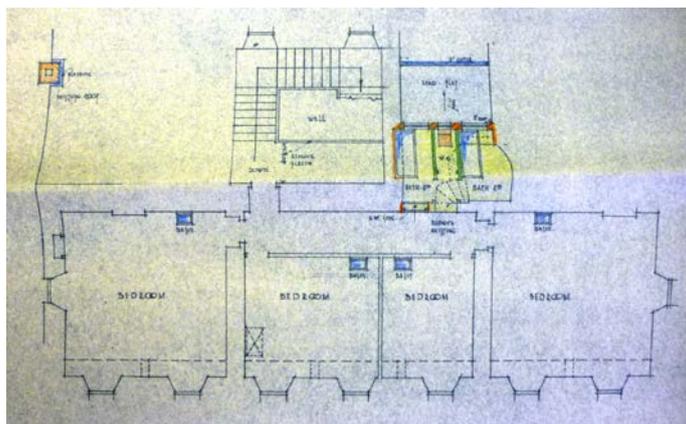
Proposed alterations and additions to the second floor, 1940 (CAC(W) SRDE/3/PLANS1/497 1940)
